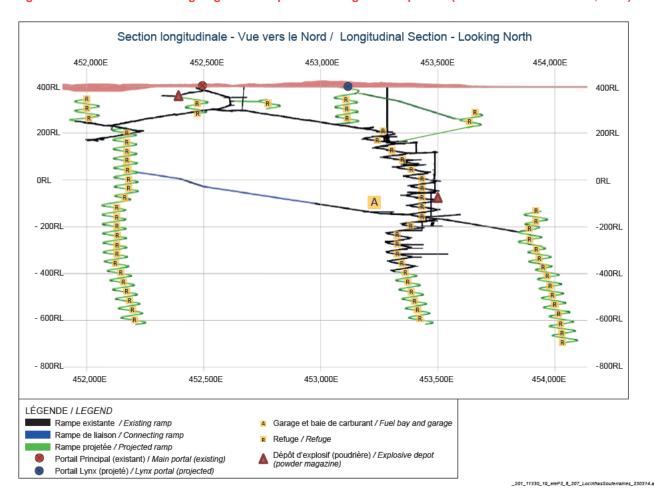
Location of the garage and ramps connecting the two portals (Modified from BBA et al., 2023)
